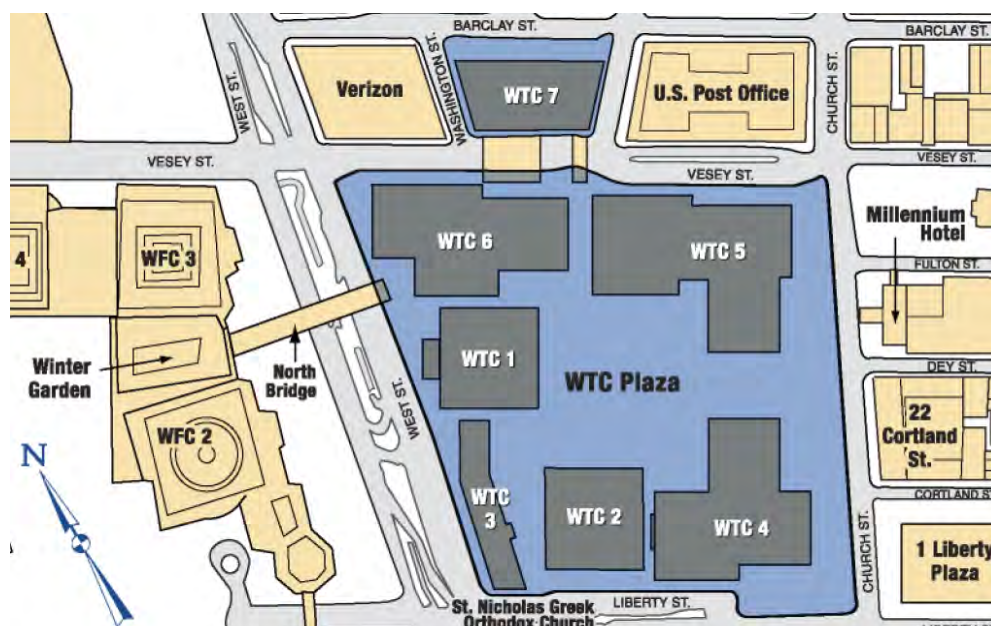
WTC site plan, showing location of WTC7 to north of main WTC site.
